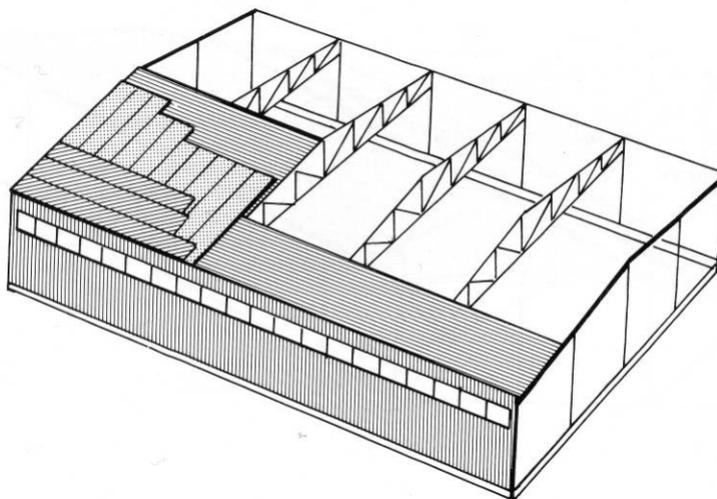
A light insulated open plan building with profiled sheeting on rafters. A gabled roof with an angle of 3.6° or 5.7° is used. The span between rafters is typically 6 to 10 m. The walls are profiled sheeting on light gauge steel beams or composite panels. The insulation is placed on top of the load bearing profiled sheeting and covered with roof material (SBI 2004).
